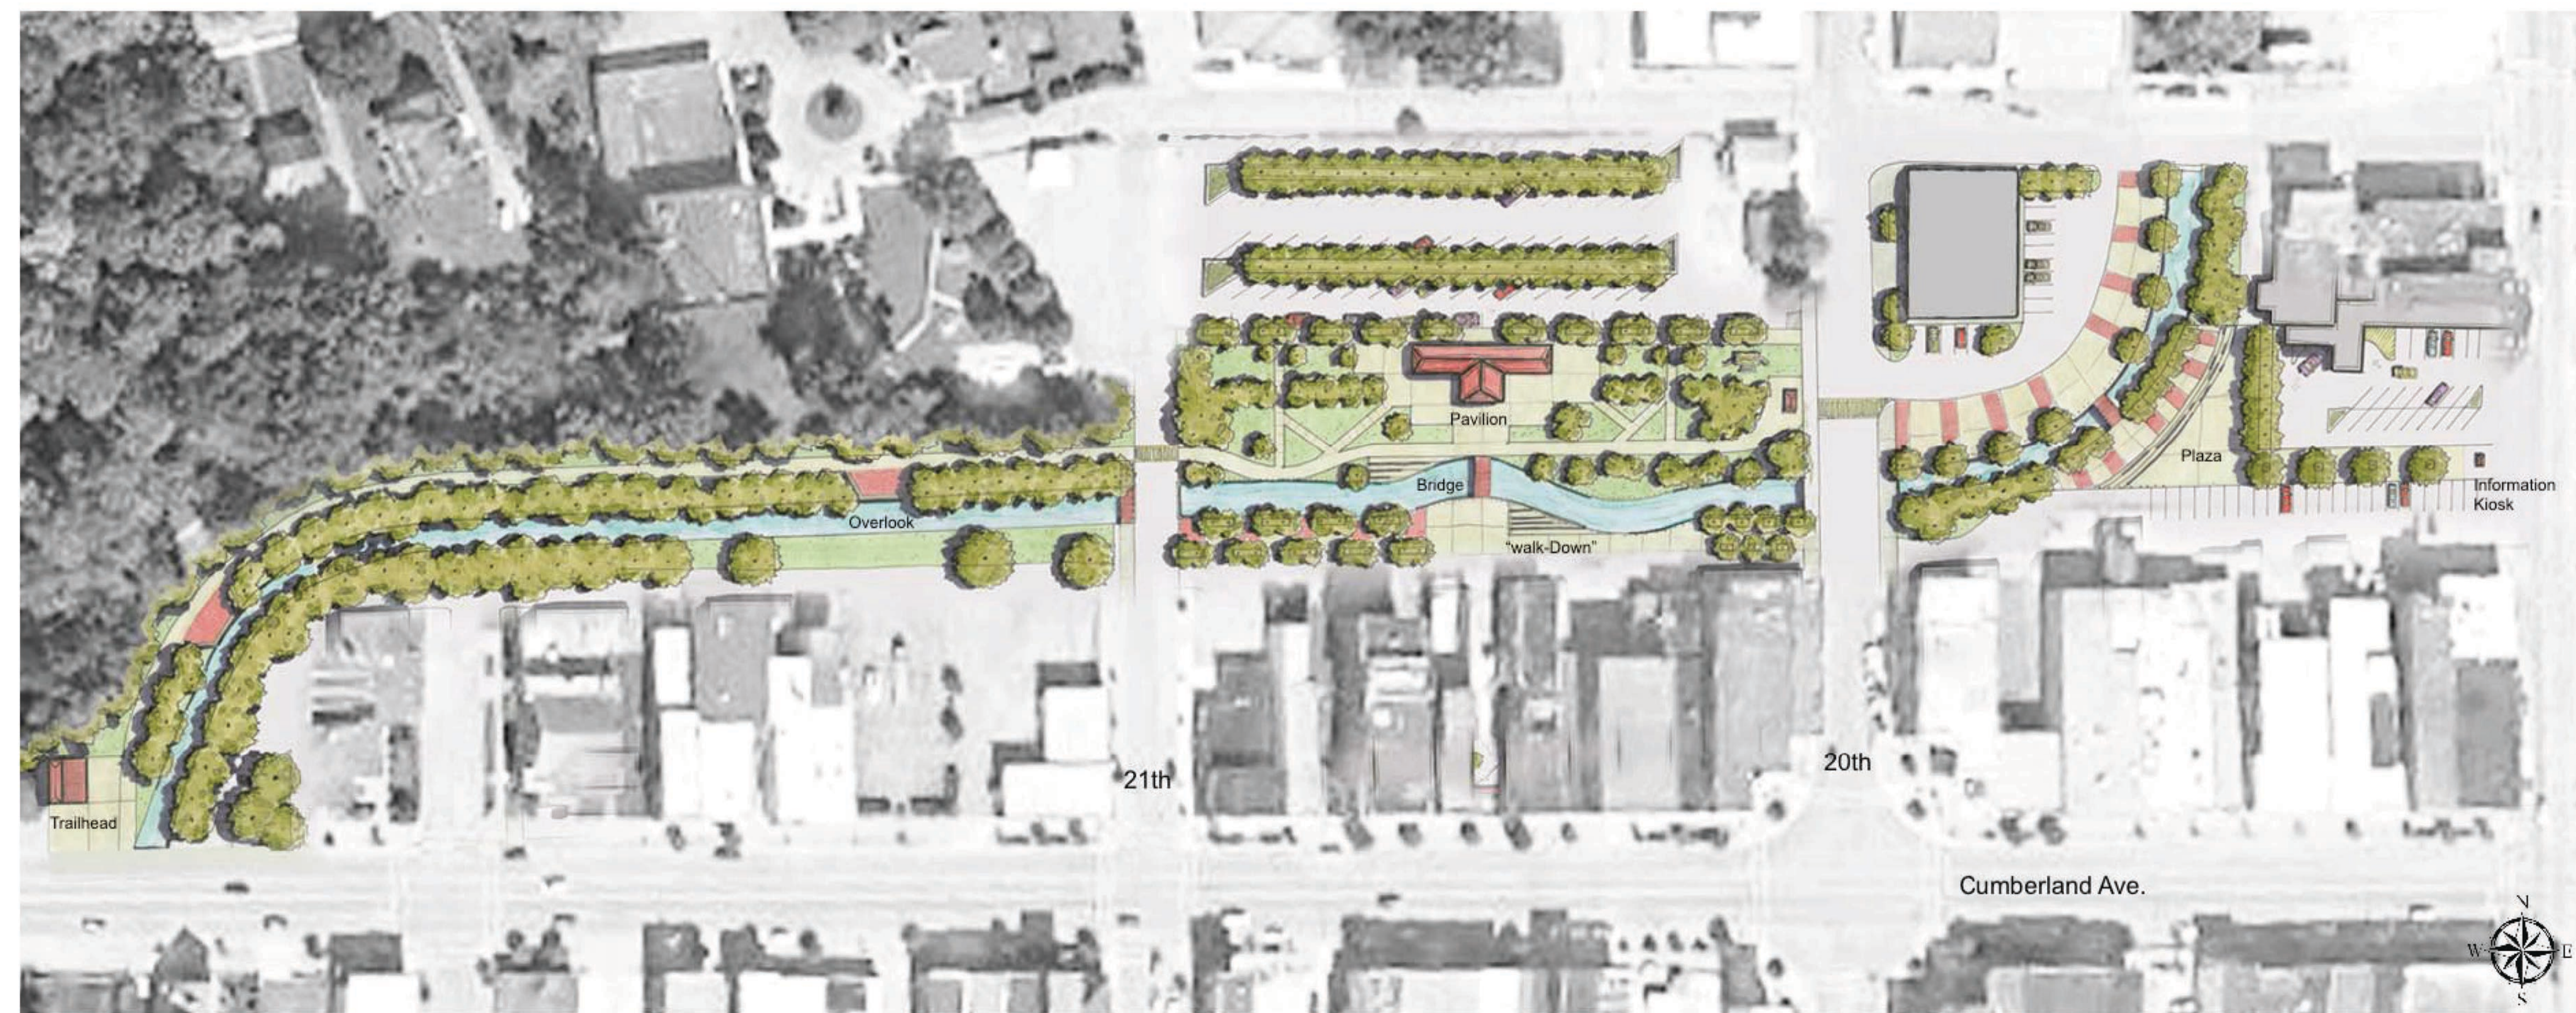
Proposed Canal Pavilion and Boulevard Master Plan
